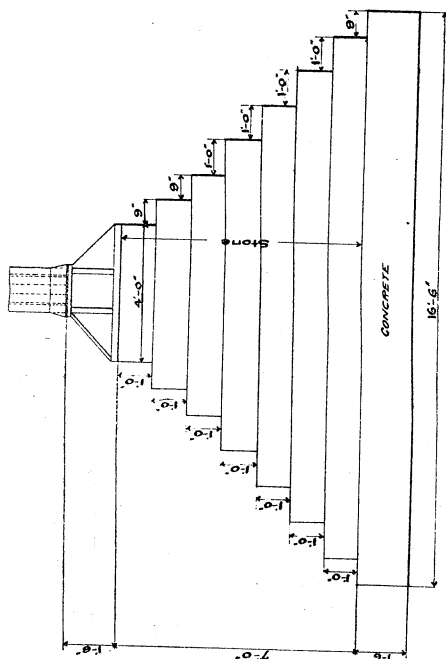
A Stone Foundation to Carry the Same Load as Provided for in Fig. 78.
